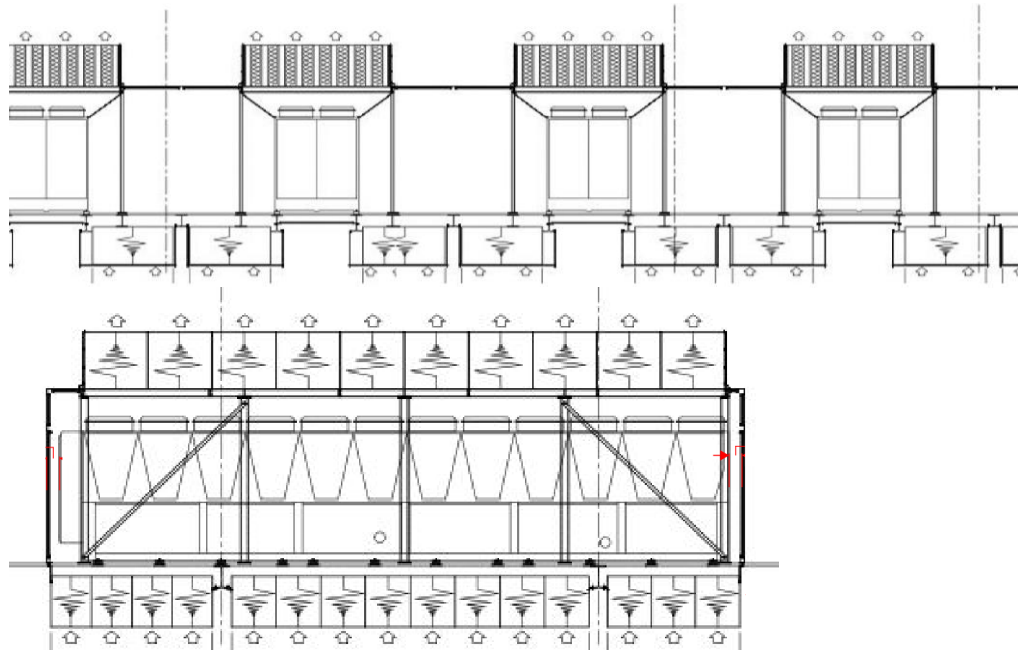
Air-Cooled Chillers Attenuation package sketch - sections
